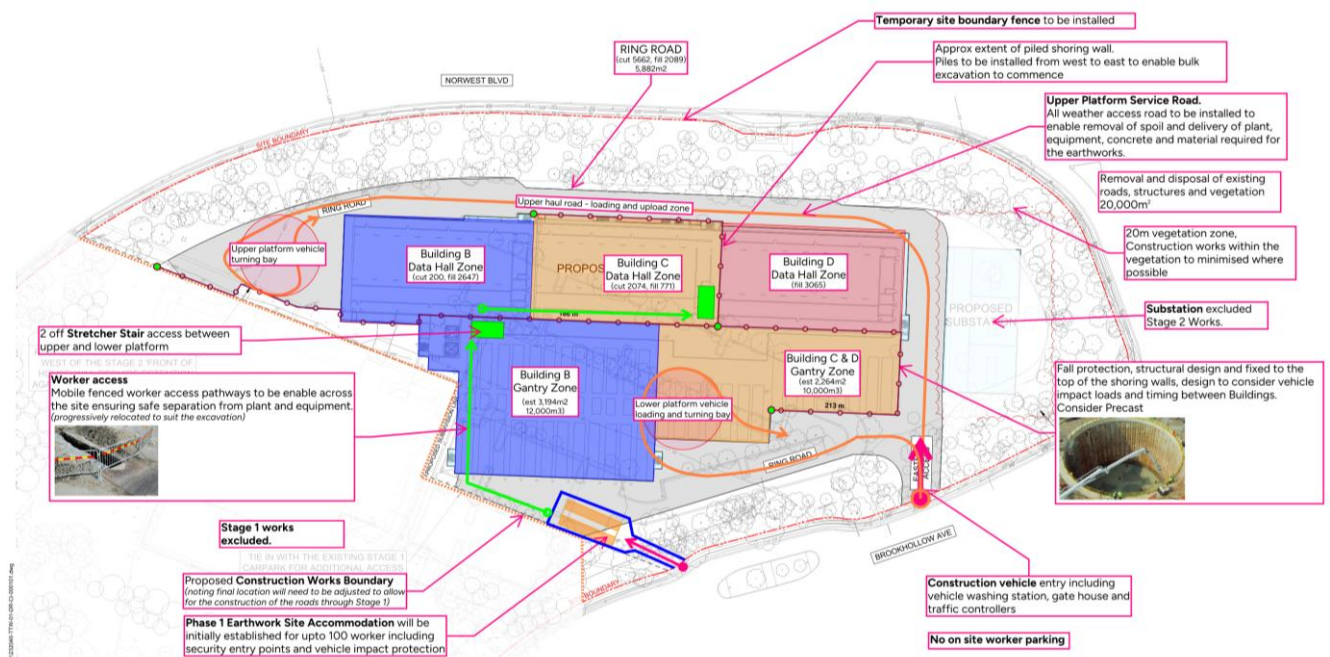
Construction Methodology for Excavation, Shoring and Piling
